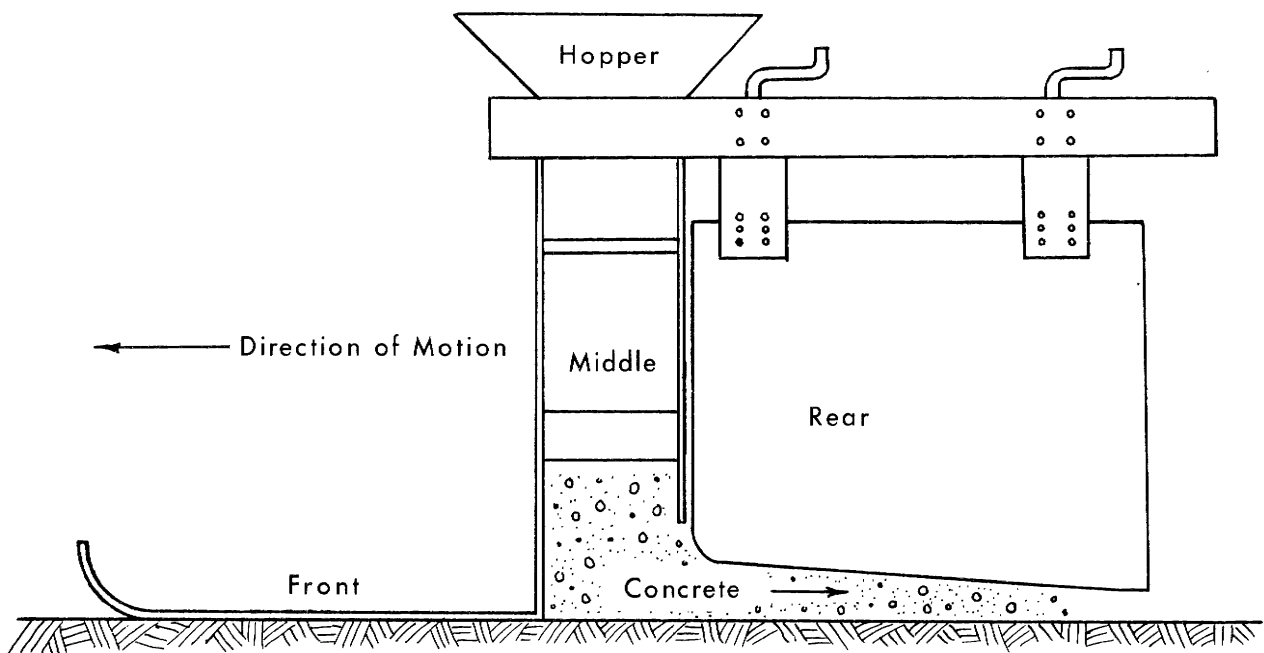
Sketch of a form used to construct slip-formed linings.
